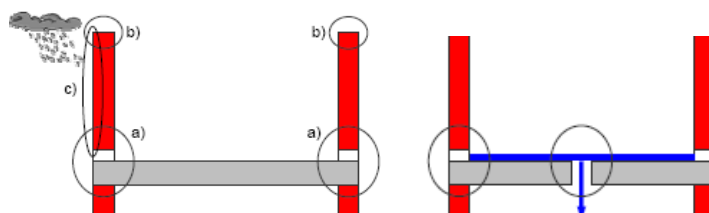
Certain parts of the unfired loam brick walls need durable protection against water and long-term moisture during the construction as well as use phase of the building.
